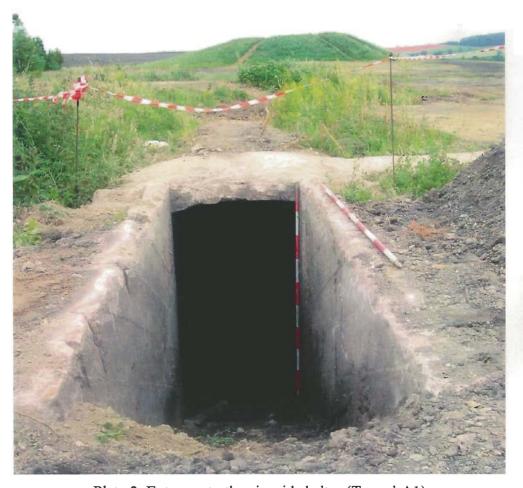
Entrance to the air raid shelter (Tunnel A1)
